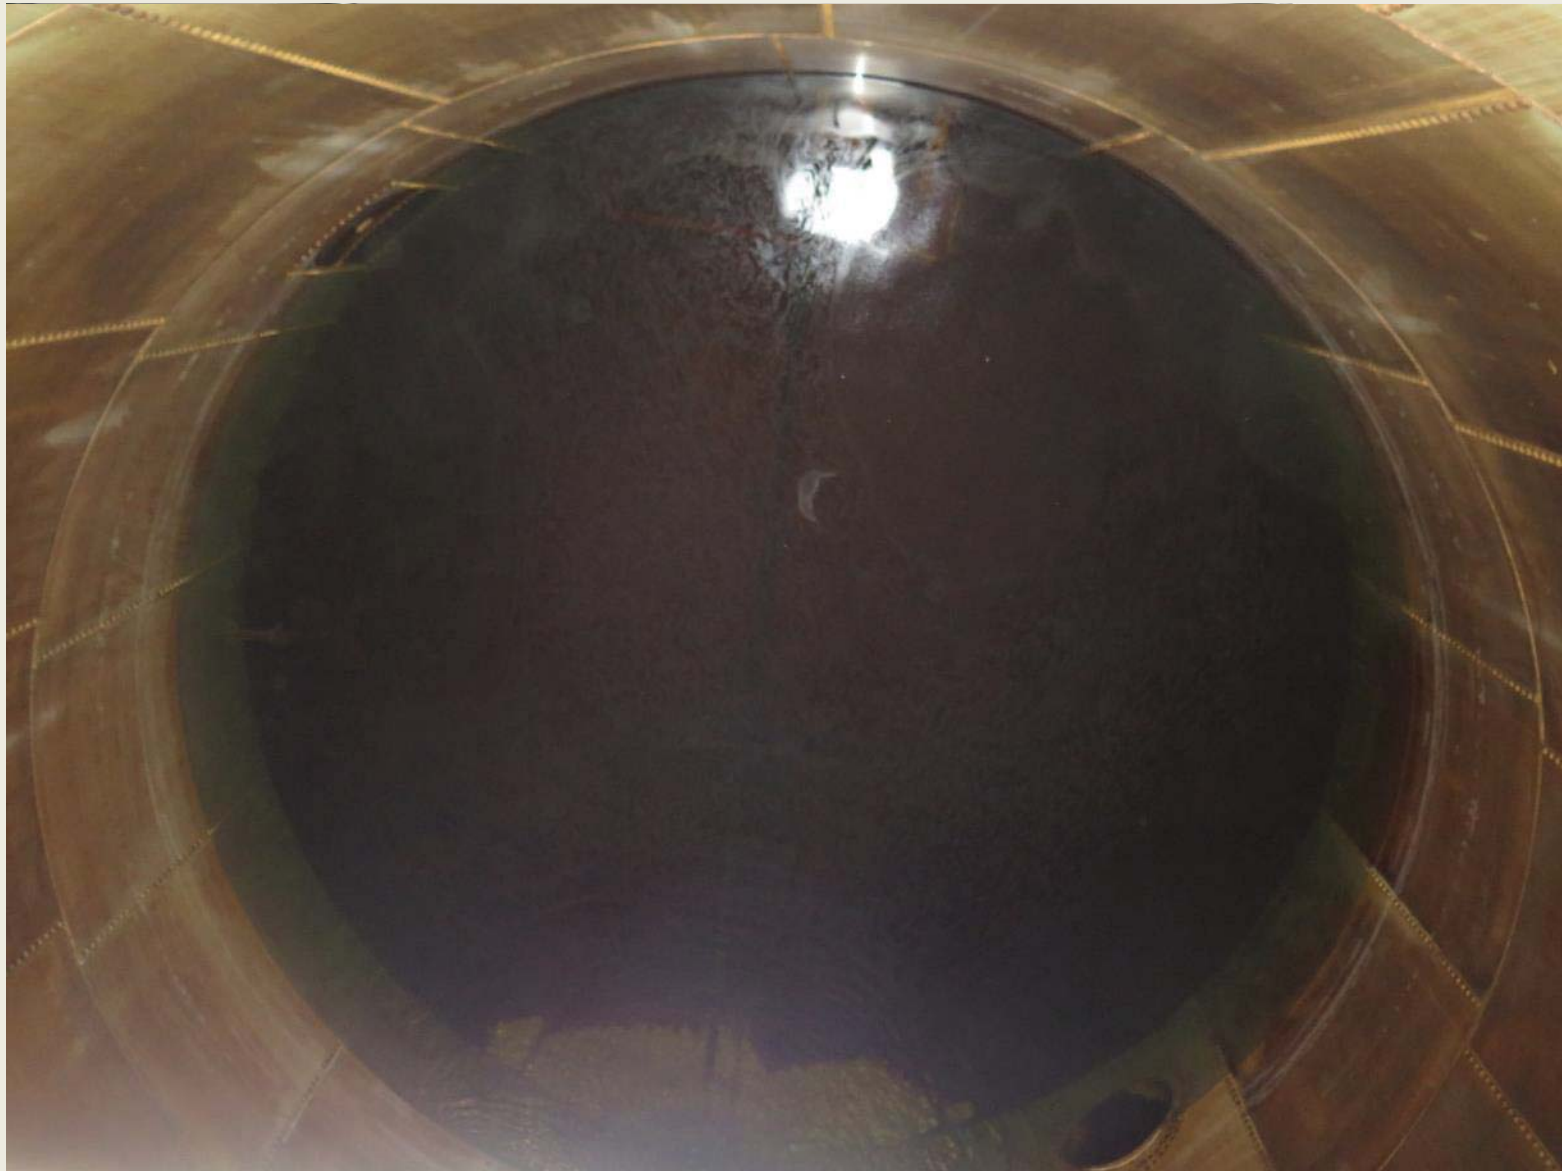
Tank interior. Tank had been cleaned about 2 weeks prior to inspection.
